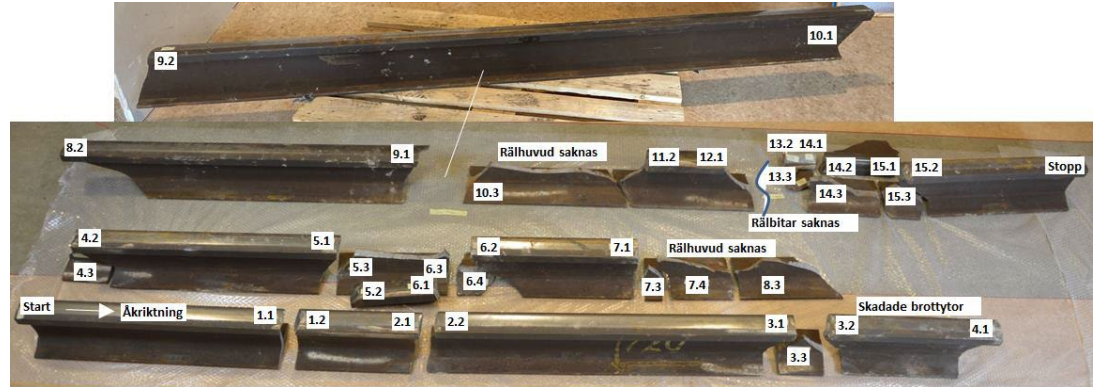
Sequential lineup of the fractured rail pieces. The fracture surfaces are numbered.
